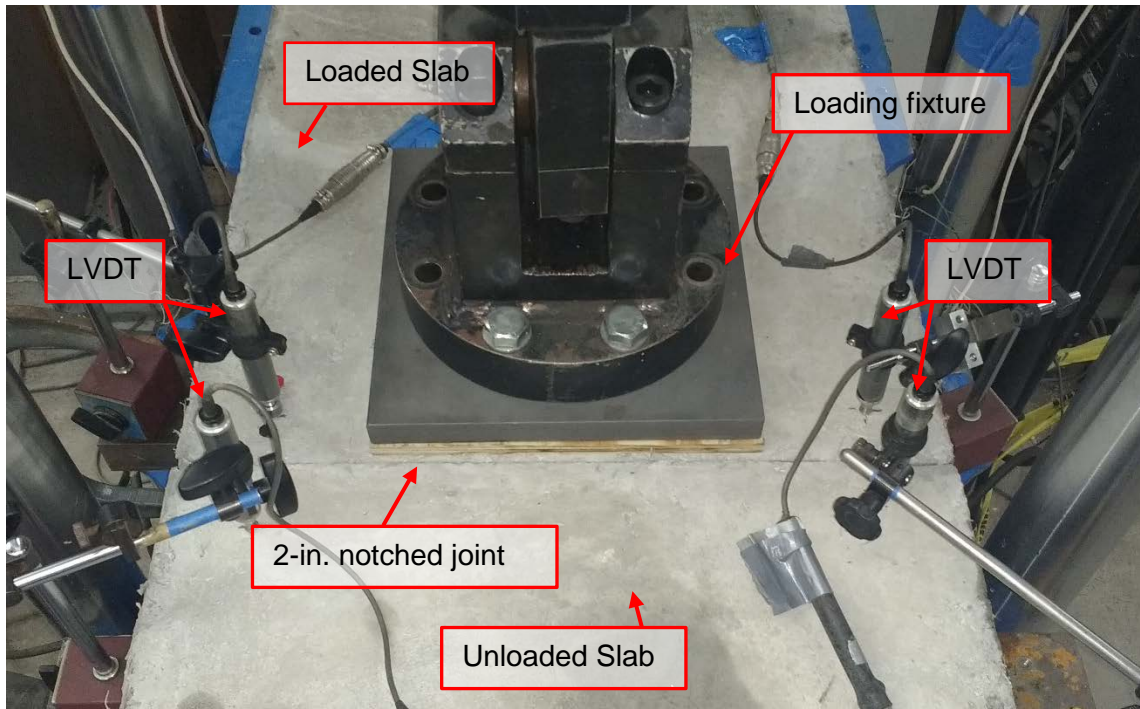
Instrumentation setup during static testing for the jointed-slab specimen.
